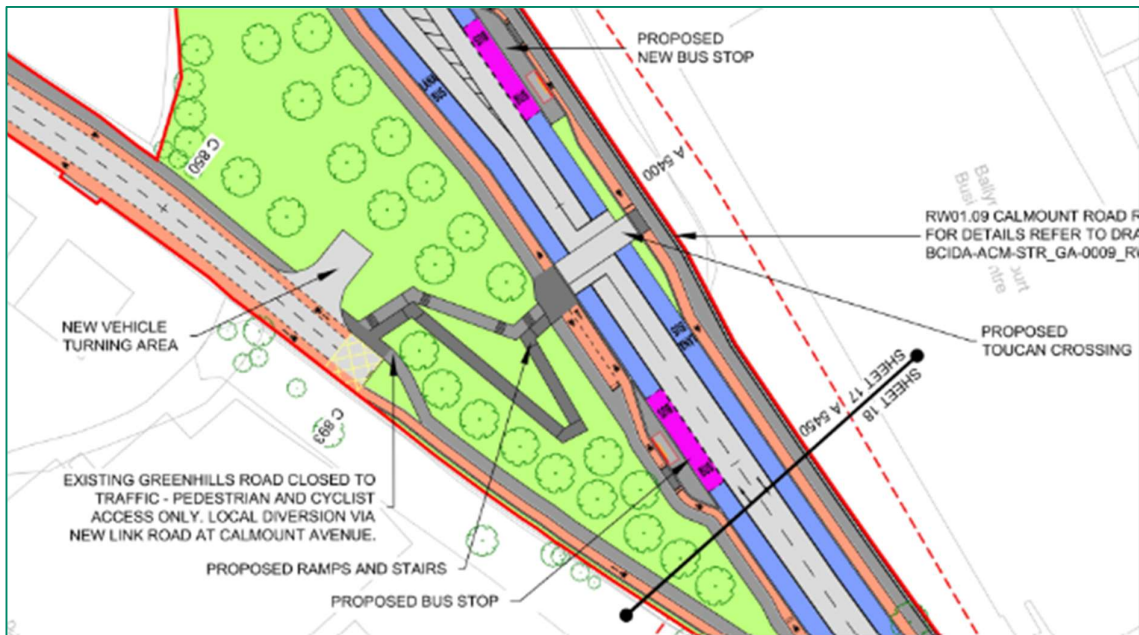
Extract of General Arrangement Drawings between the extended Calmount Road and existing Greenhills Road
